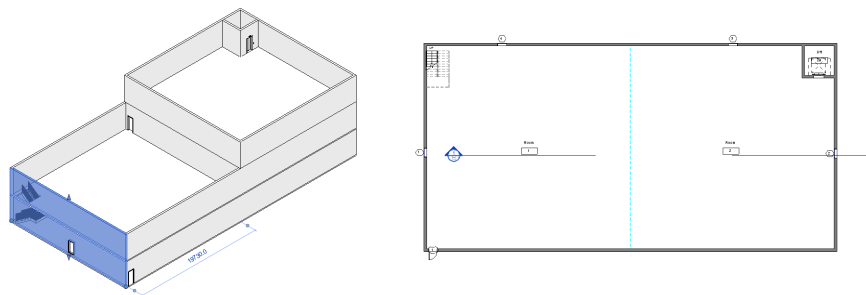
The Simple Model: A three storey model with stairs and an elevator beside its first story floorplan. A floor by floor breakdown is available in the appendices
